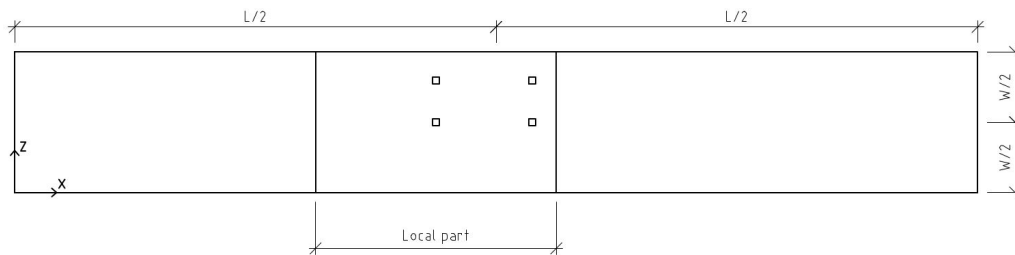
The heaviest axle load is placed at a truss joint, load position (a).
